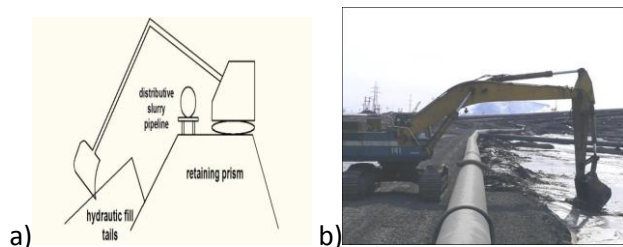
Arrangement of a secondary banking dam of hydraulic fill tails with the help of excavating equipment
